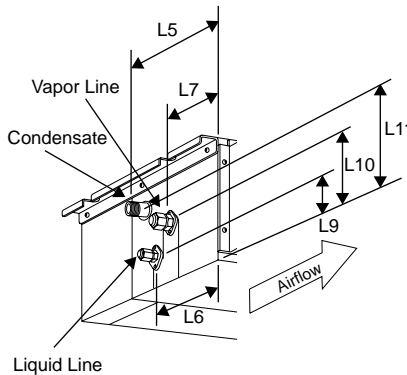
Low-Static Ducted Bottom Return (B3, B4) Indoor Unit Piping Connection Dimensions.
